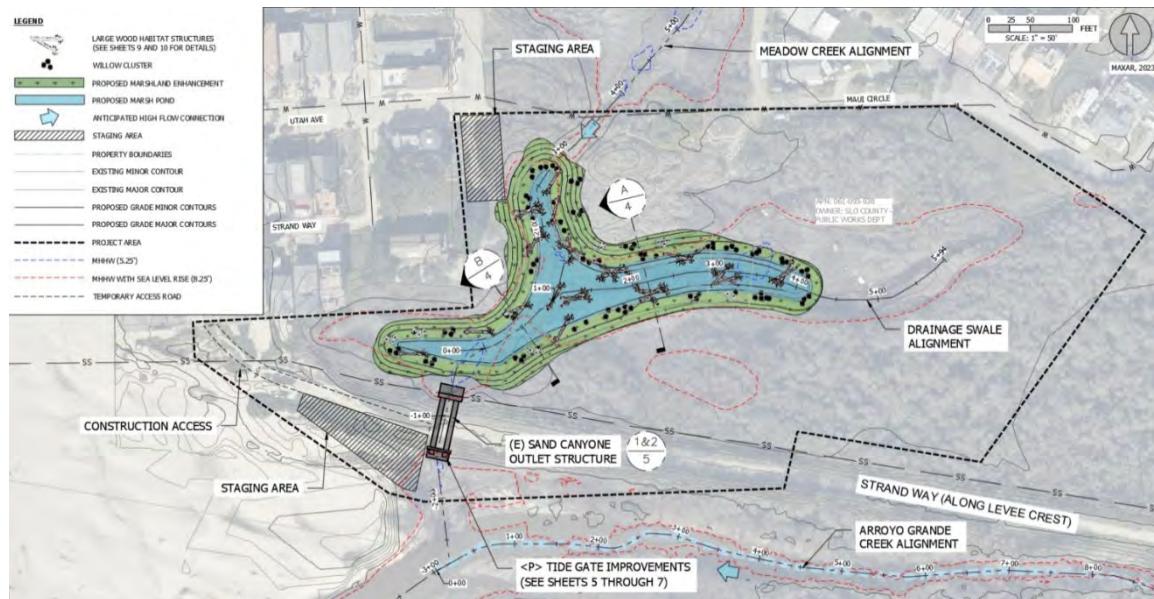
Meadow Creek Lagoon Enhancement Project - 30% Design - Plan.
